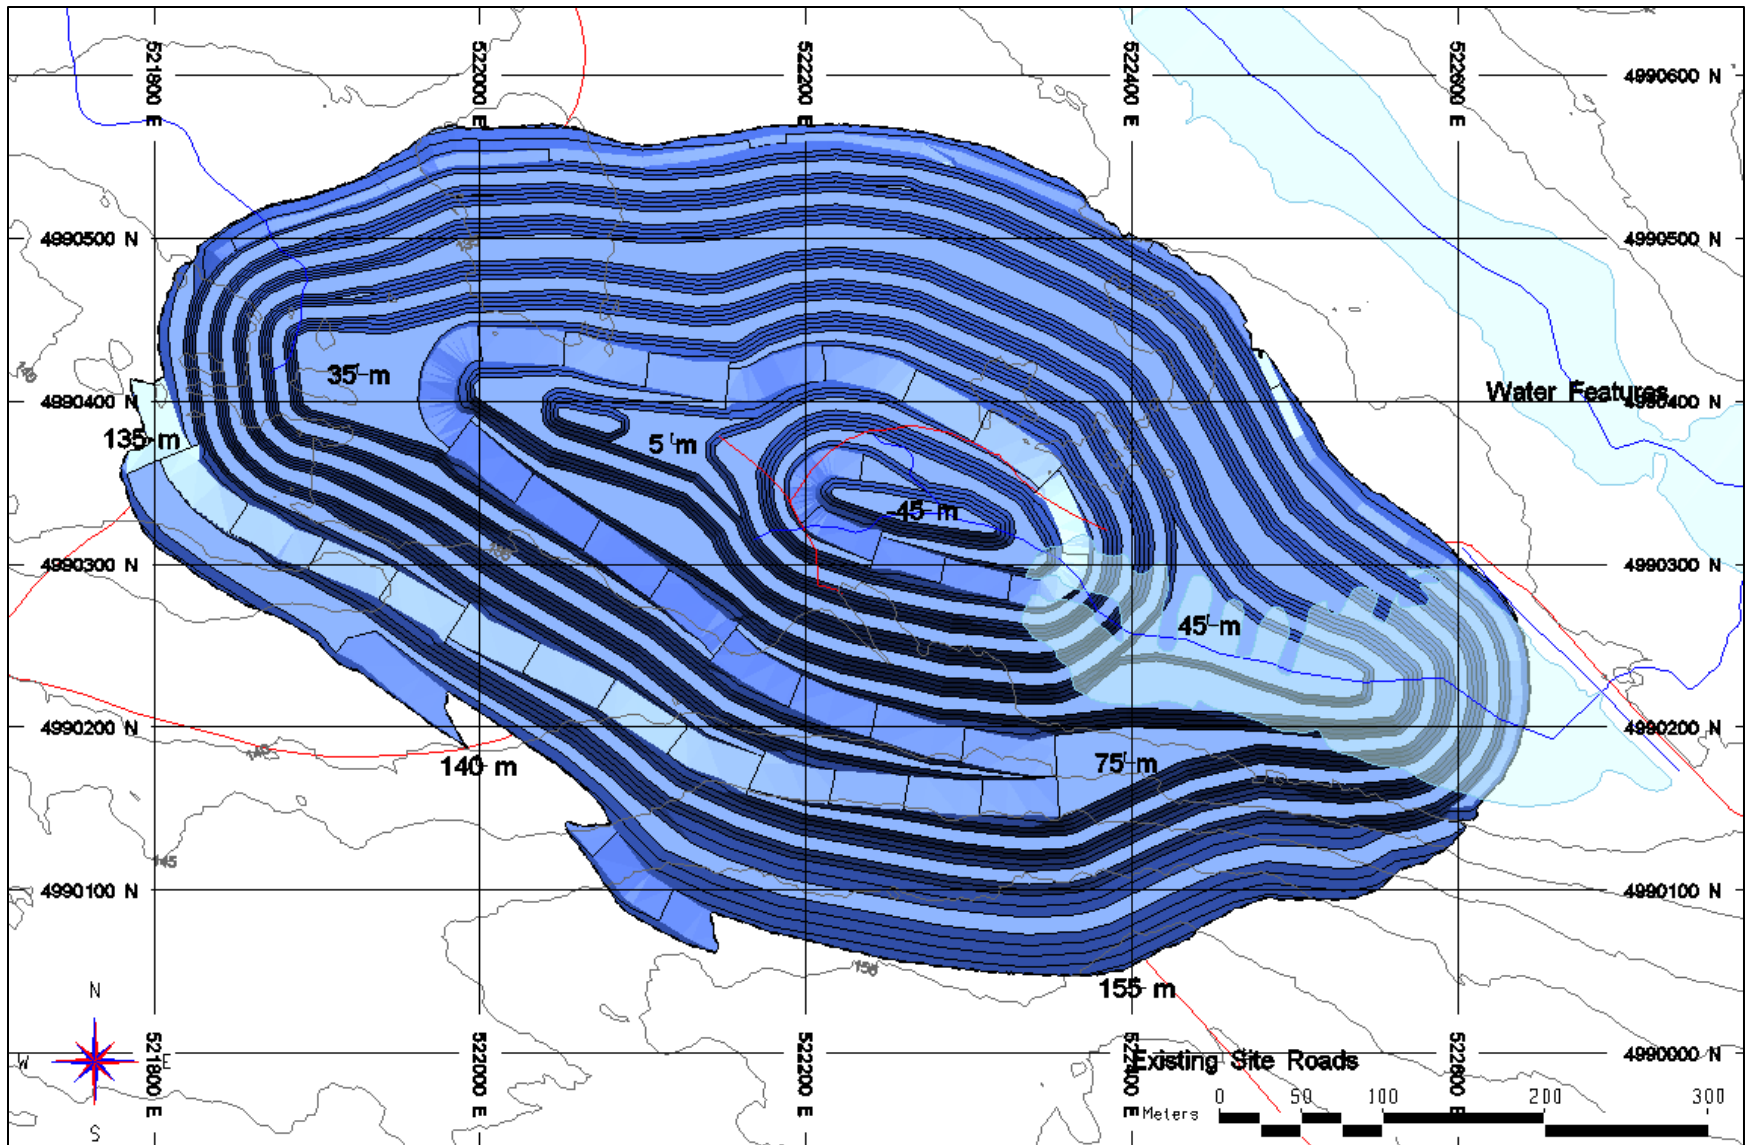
Phase 2 Detailed Pit Design, P612, Plan View (not for construction)
